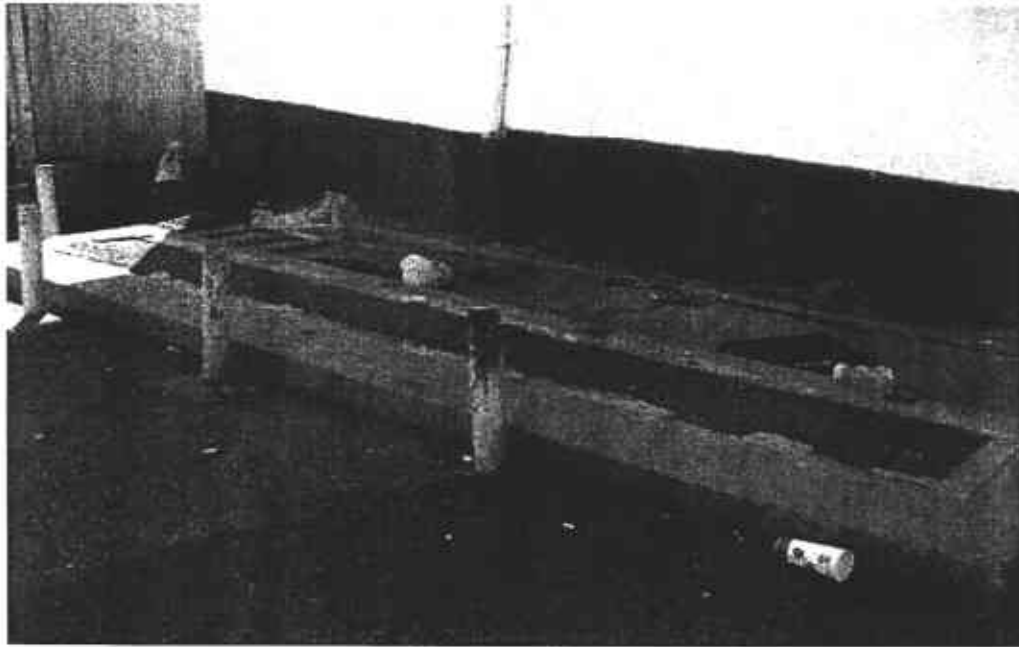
View looking at a concrete block located on the southeastern portion of the subject property.
